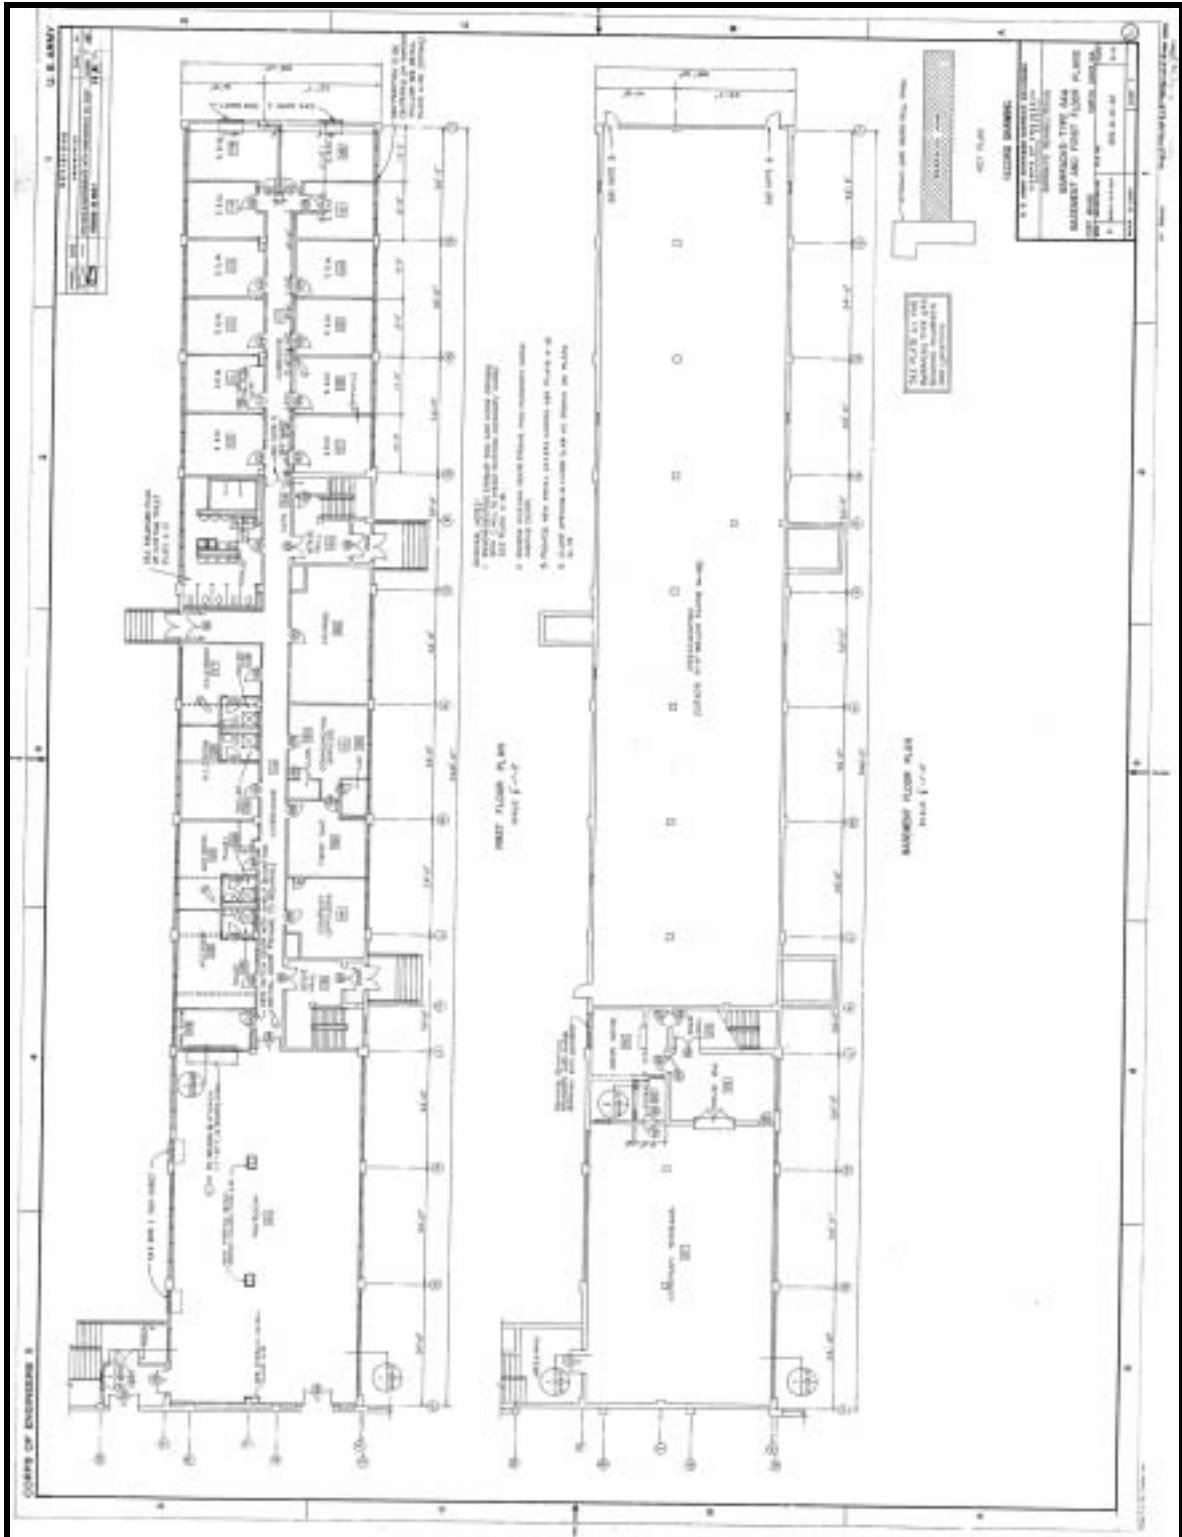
Renovated hammerhead barracks, basement and first floor plans, barracks wing (1972, revised 1974) (Engineering, Ft. Bragg).
